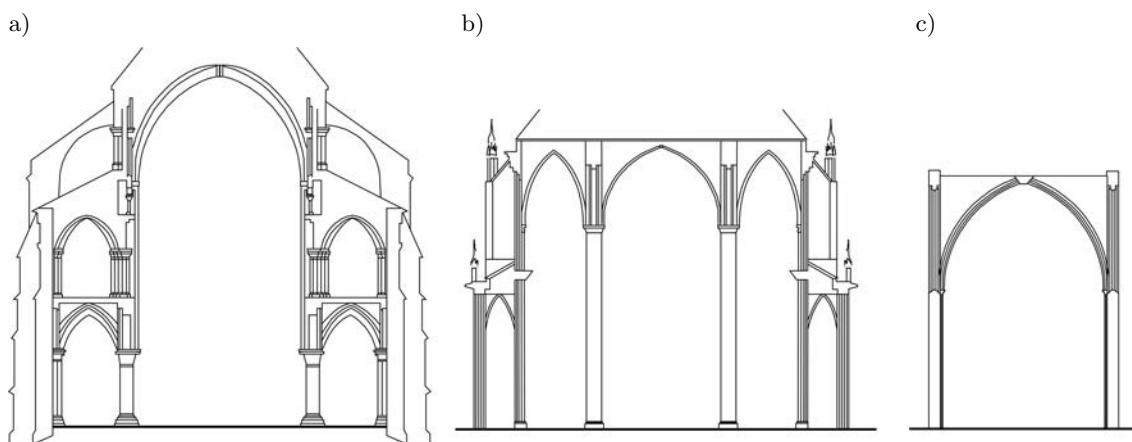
Cross-sections of historical churches: a) basilica, b) hall church, c) aisleless church
